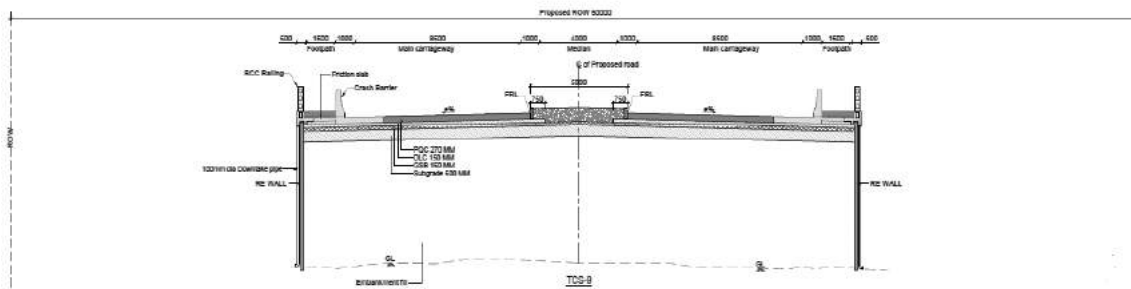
TCS-9 TCS Of Approach to Road Over Bridge
